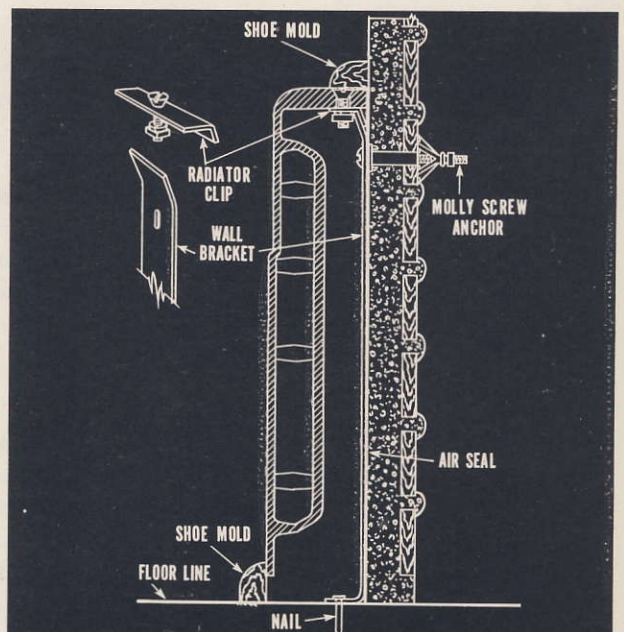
Installation details for type R Radiant Baseboard Panels.
